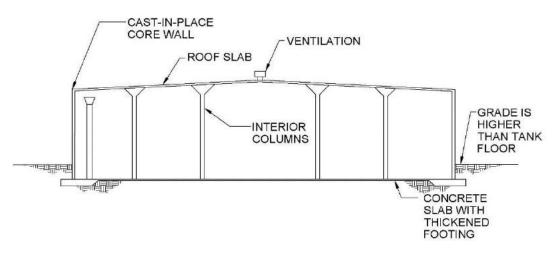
Type 1 Prestressed Concrete Tank w/Cast-in-place Core Wall
